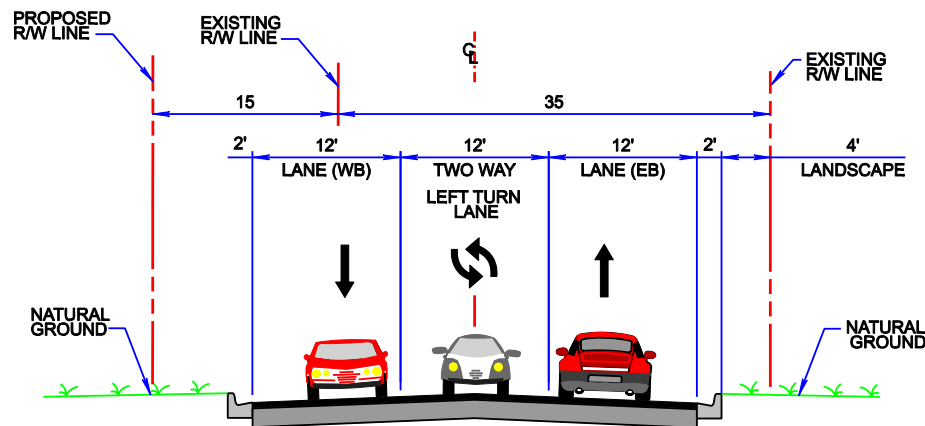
I NW 127th Street from NW 107th Avenue to NW South River Drive (2008)
